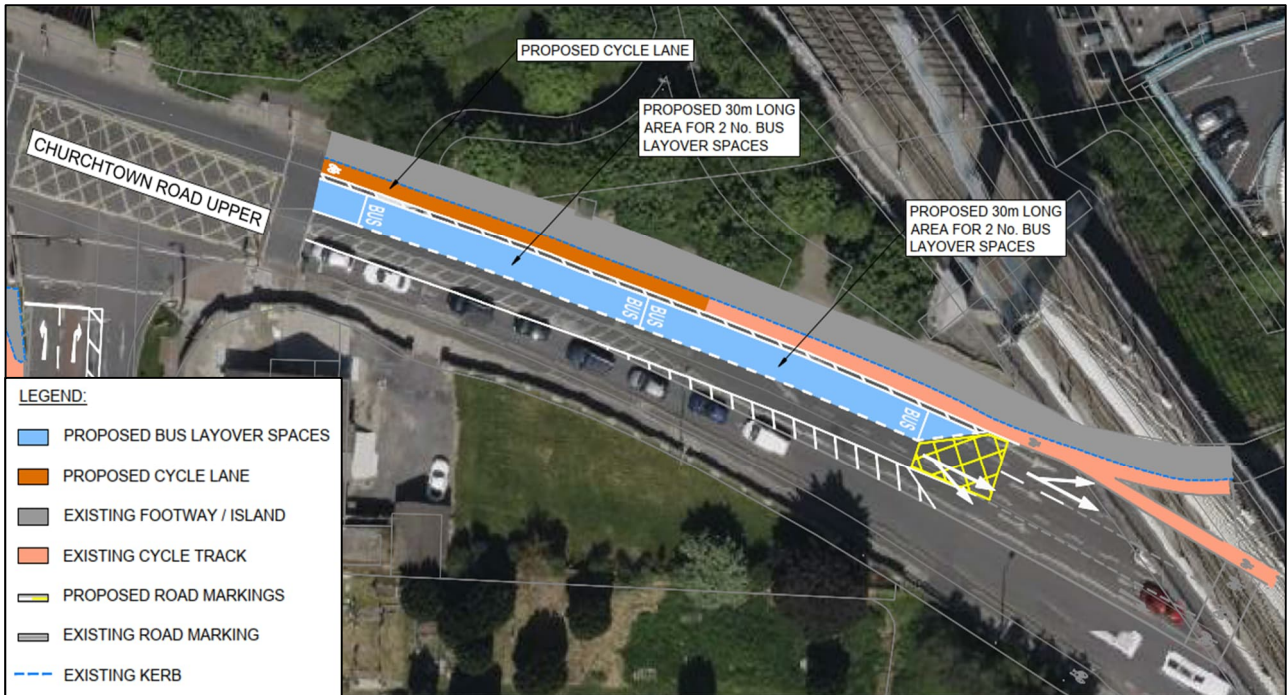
Churchtown Road Upper (Eastbound) Preliminary Design
